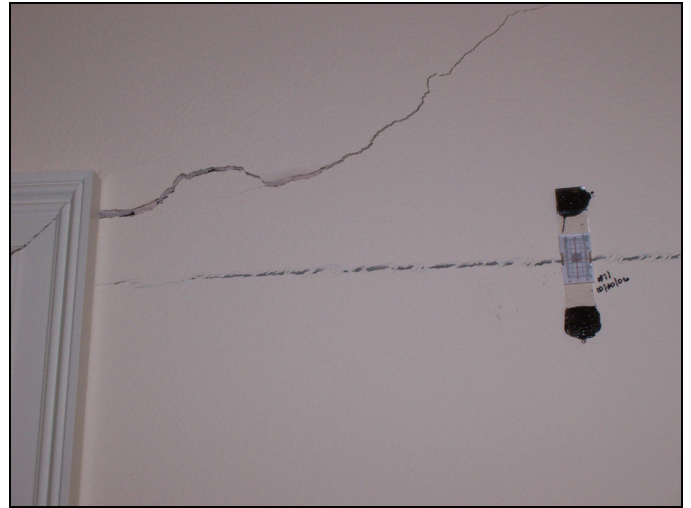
Close up view of wall crack showing new crack and additional movement.
